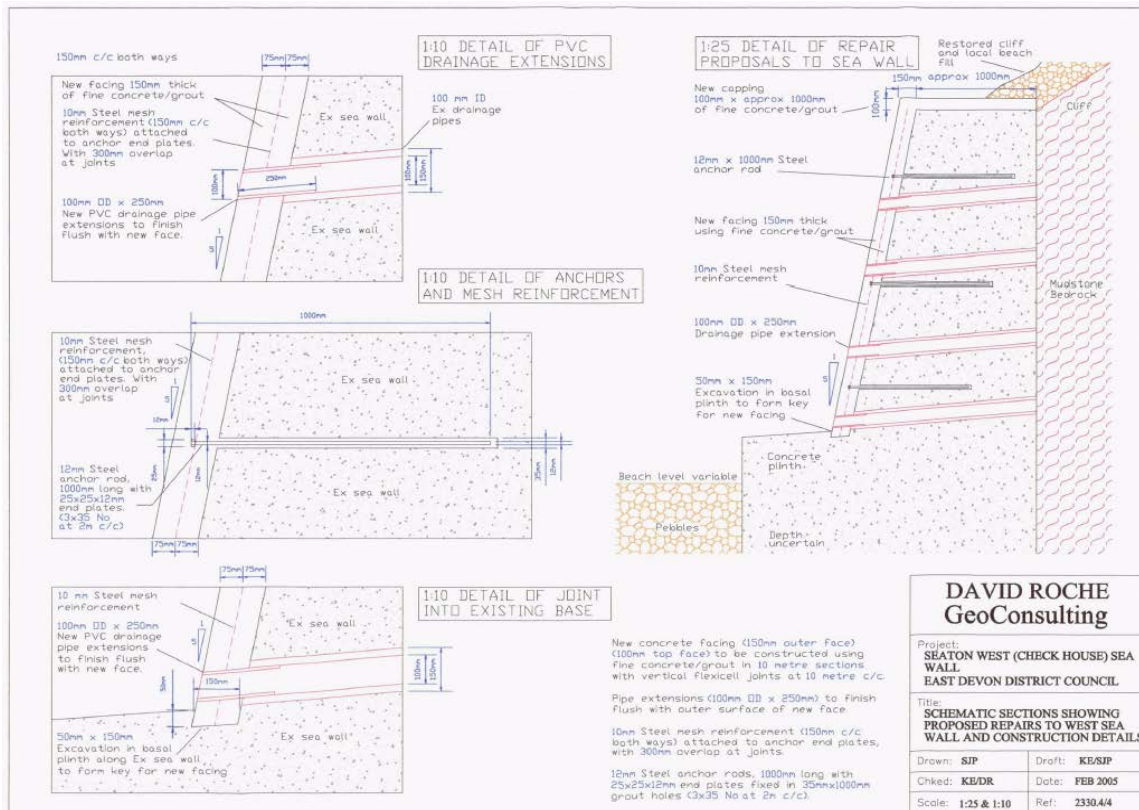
Schematic section showing proposed repairs to the west sea wall and construction details
